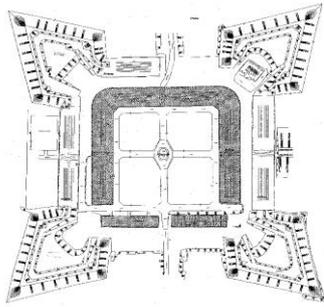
Details from Restauration Plan for Fortress central square, Cavalier, chapel and clock tower
